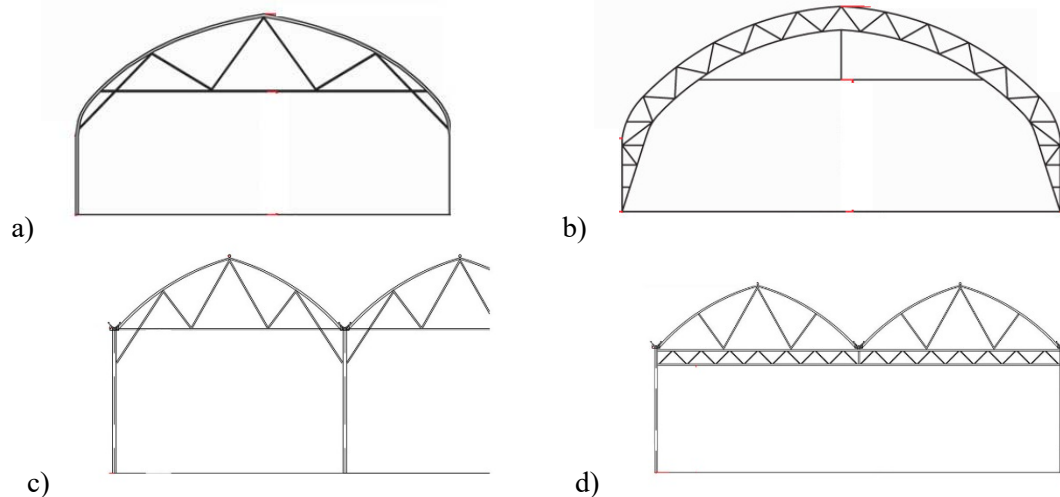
Cross section of the foil tunnels a) small single span tunnel – up to 9,6 m, b) large single span tunnel – up to 20,0 m, c) multi span tunnel, d) single span tunnel – span of 12,8 m
